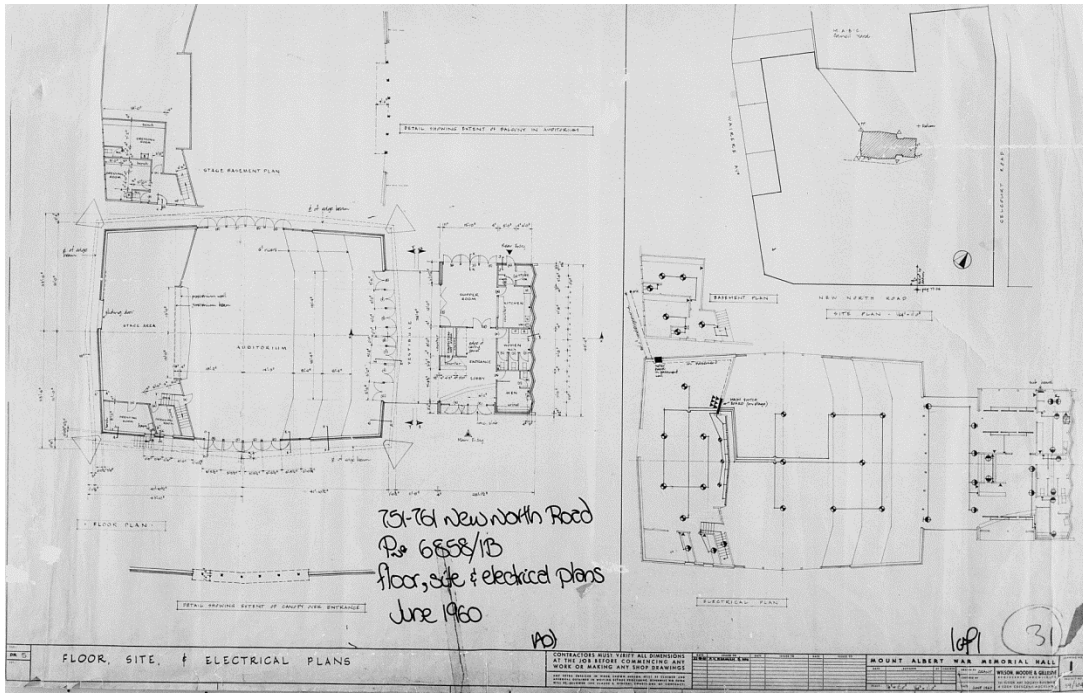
Drawings show the location of the memorial hall and the floor plan of the hall. Auckland Council Archives microfilm, June 1960.
